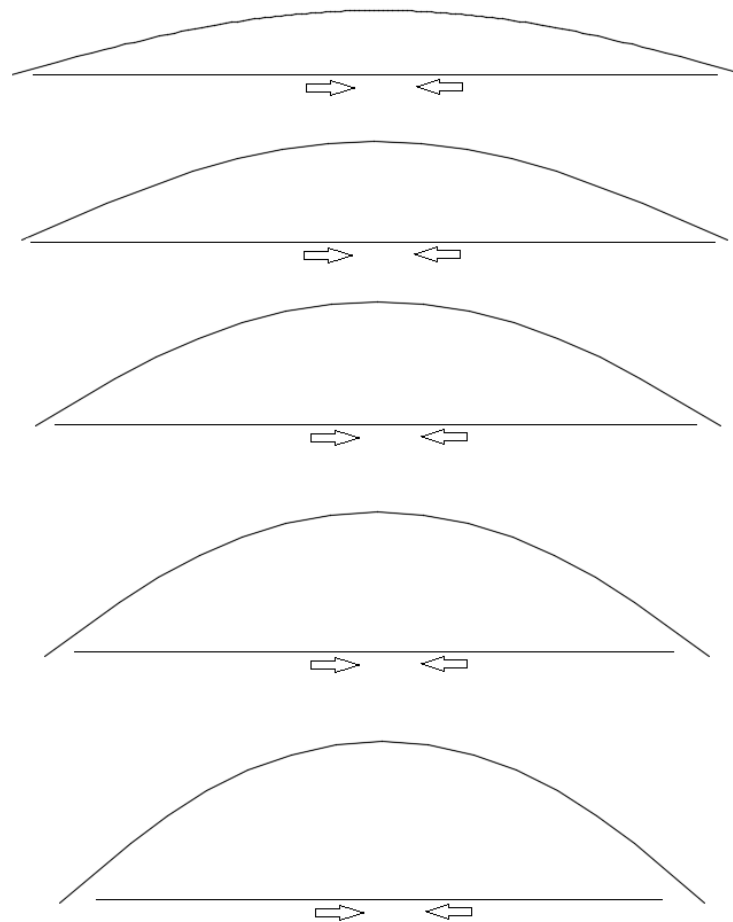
Putting axial load to generate final shape of the spline pipe (erection process),
